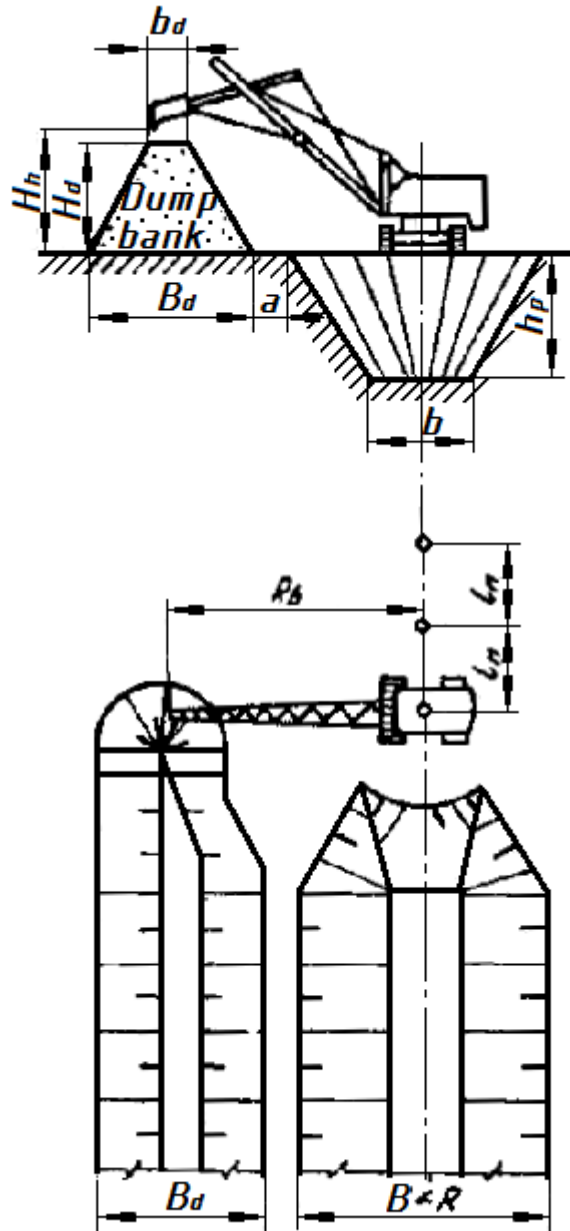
Scheme of a digging face when developing trenches with an excavator equipped with a backhoe
